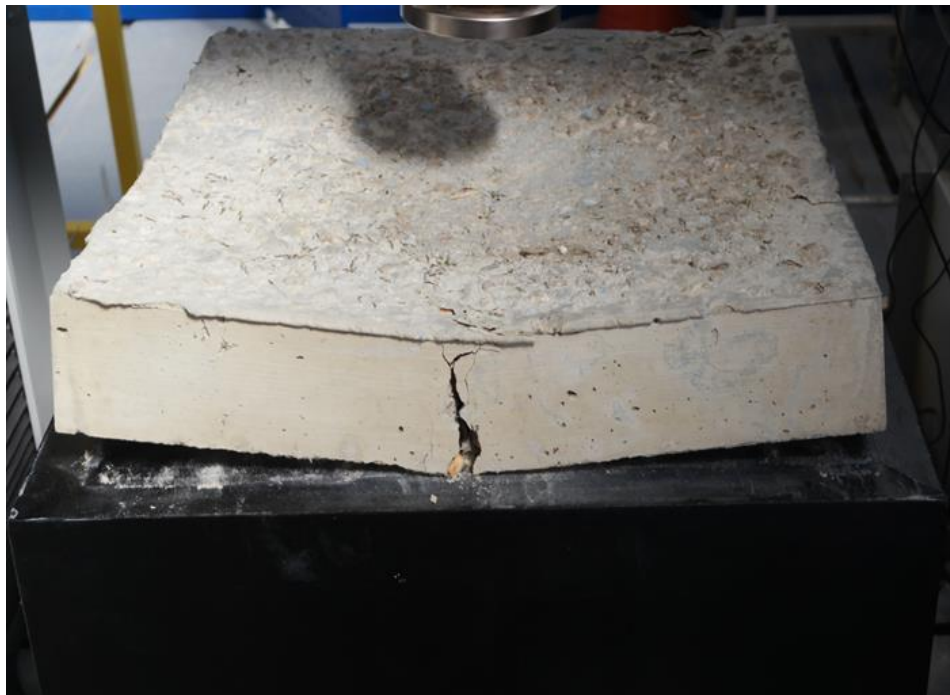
Mode of cracking on side and surface of slab 20 mm + 45/50 at testing position
